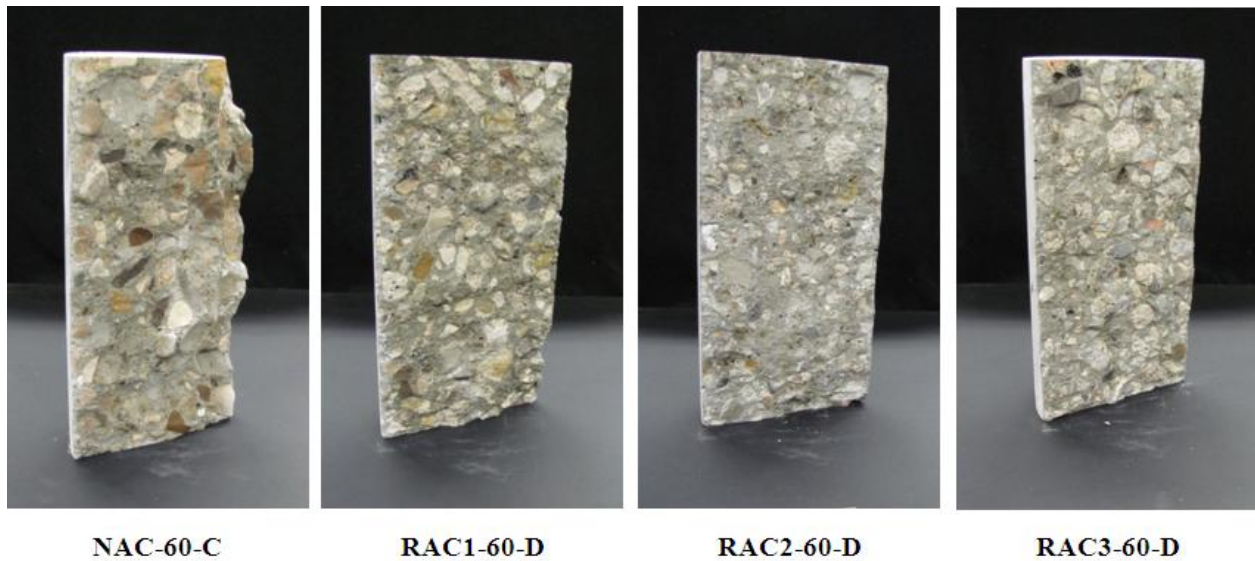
Fracture surfaces of the phase 2 60 MPa direct replacement splitting tensile strength specimens
